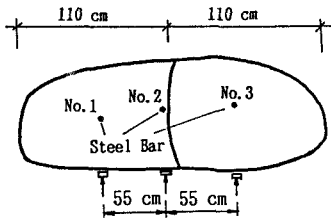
PLAN-VIEW OF IN-SITU TEST
